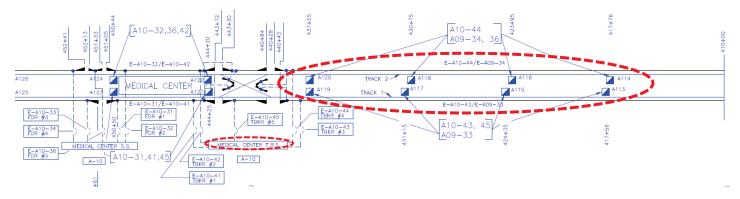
CONTACT RAIL SCHEMATIC SHOWING WAYSIDE ETS BOXES POTENTIALLY AFFECTED (ONLY BOXES IN TUNNEL AND NOT ON PLATFORMS)
